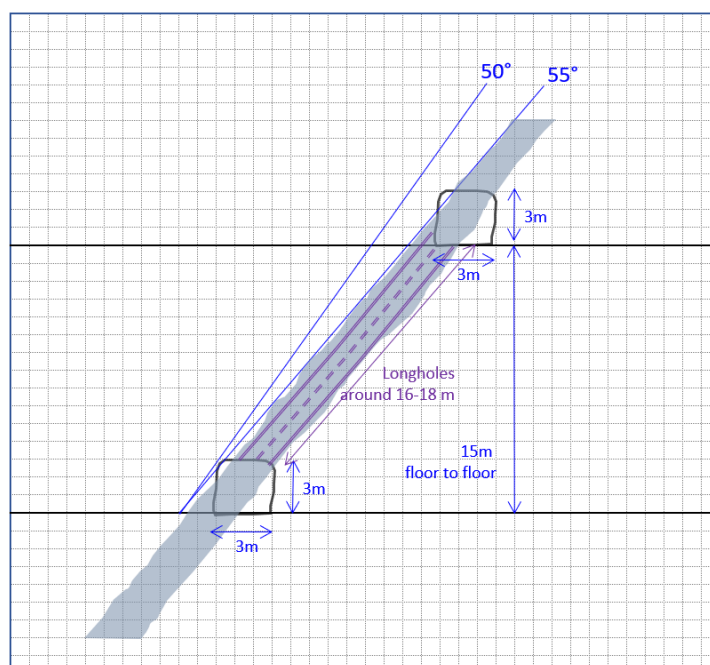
Schematic Cross Section View of Strike Drive and Stope Geometry (1m grid)
